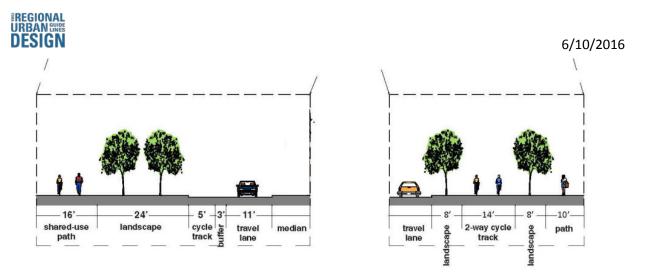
Two-Sided Trail Parkway Street Section – Option 1: Two Lane Road with Cycle Track; Figure 7c. Two-Sided Trail Parkway Street Section – Option 2: Walking and Cycle Facilities.
